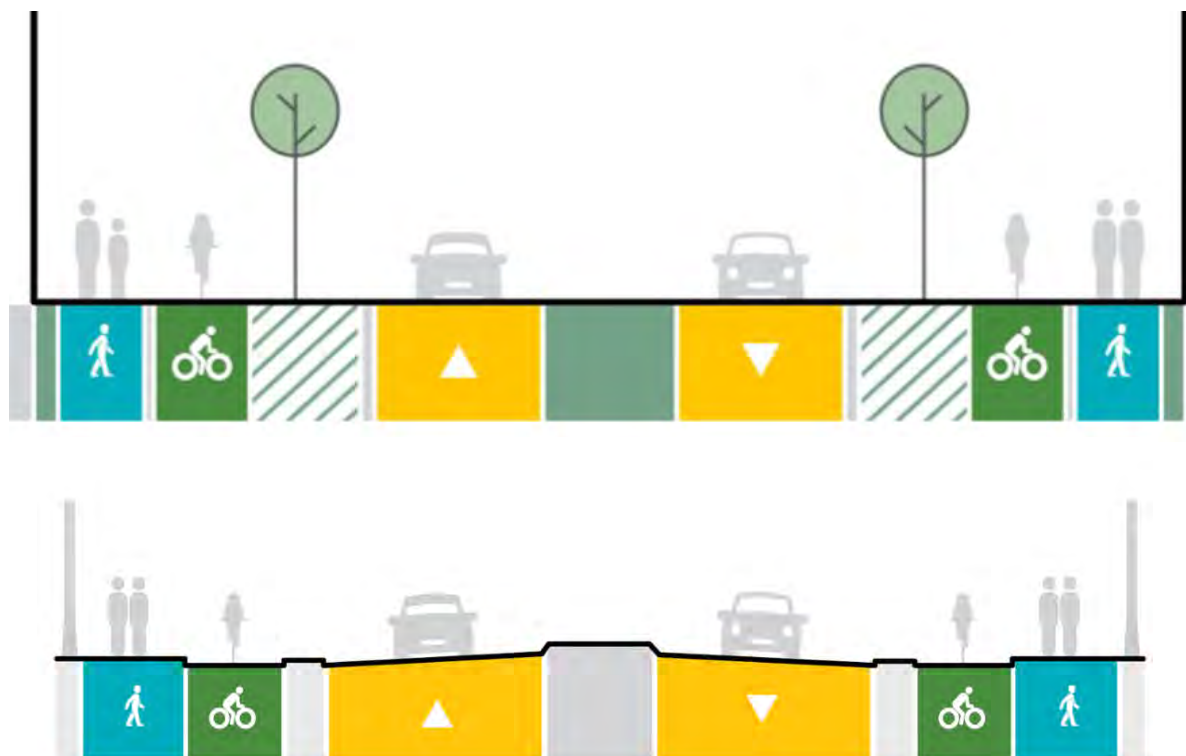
Spedding Road Upgrade Typical Cross Section – Corridor and Bridge
